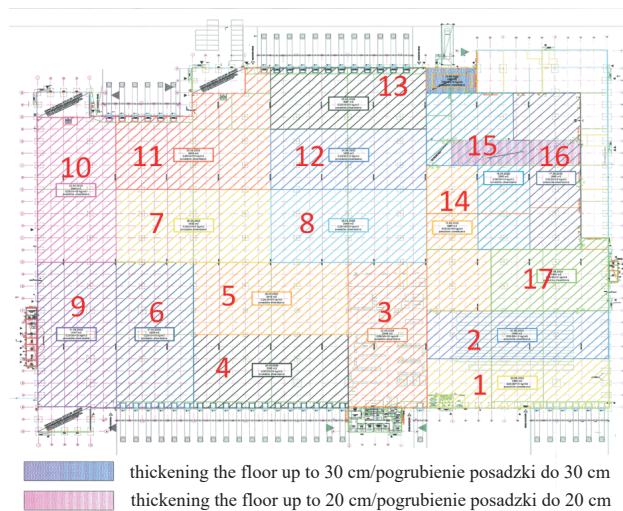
The process of pouring concrete for the floor and dividing the area into work sections
